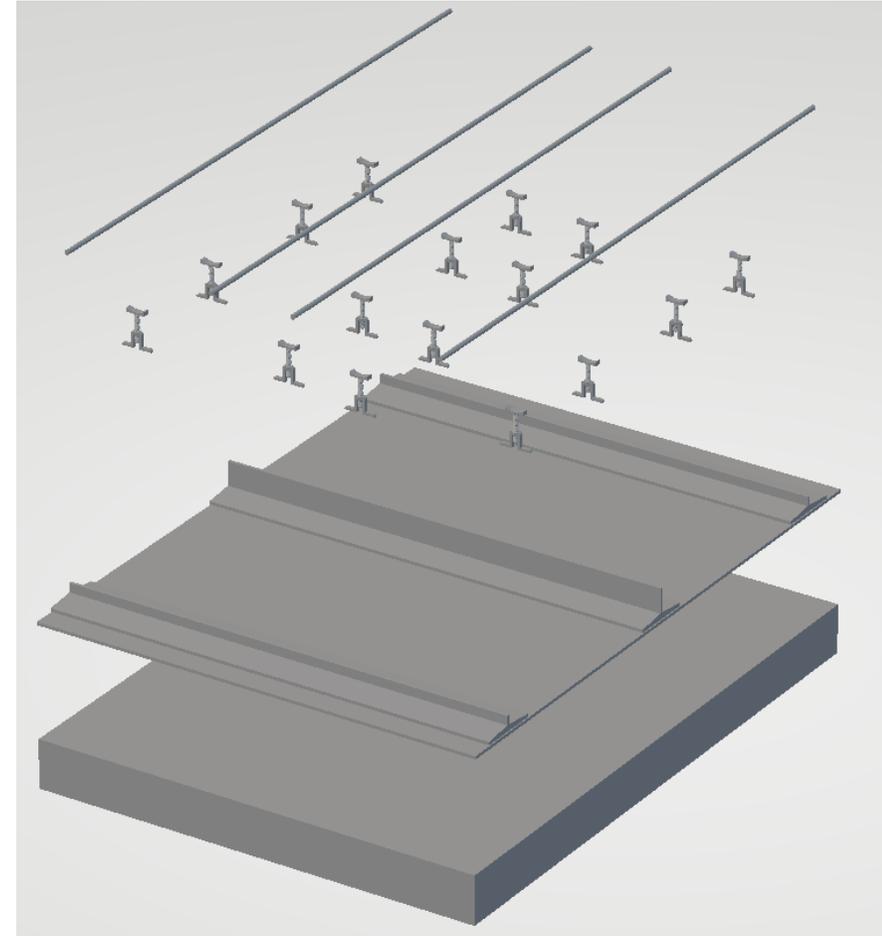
Specimen, riser and restraints, reinforcement, and chairs
